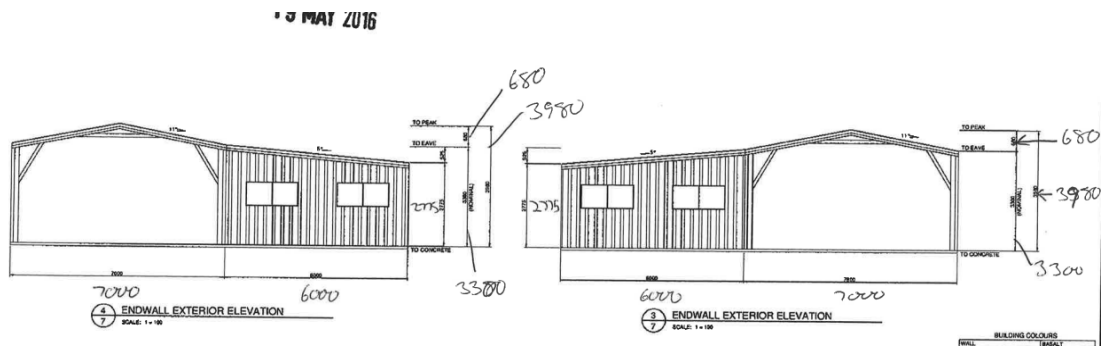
Elevations – East elevation on the left side and west elevation on the right.
